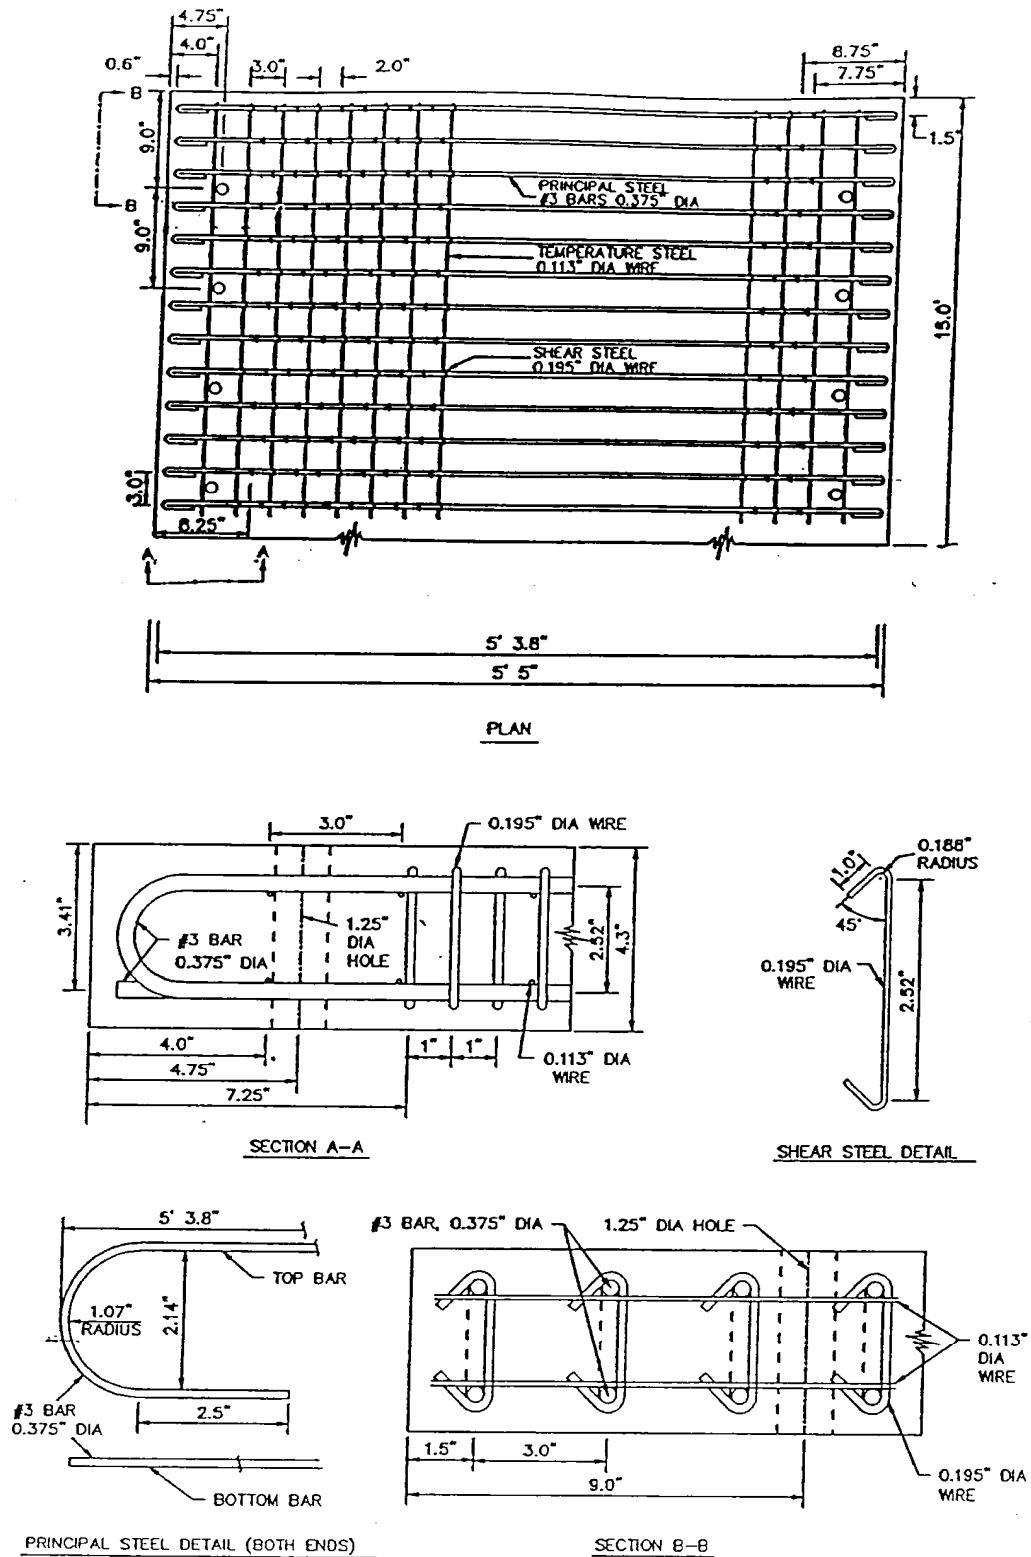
Reinforced Concrete Slab Construction, Tests 1 and 3 (Courtesy of Baylot (1993))
